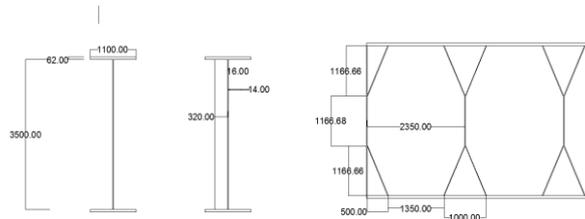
Cross section of the plate girder with octagonal stiffener arrangement
